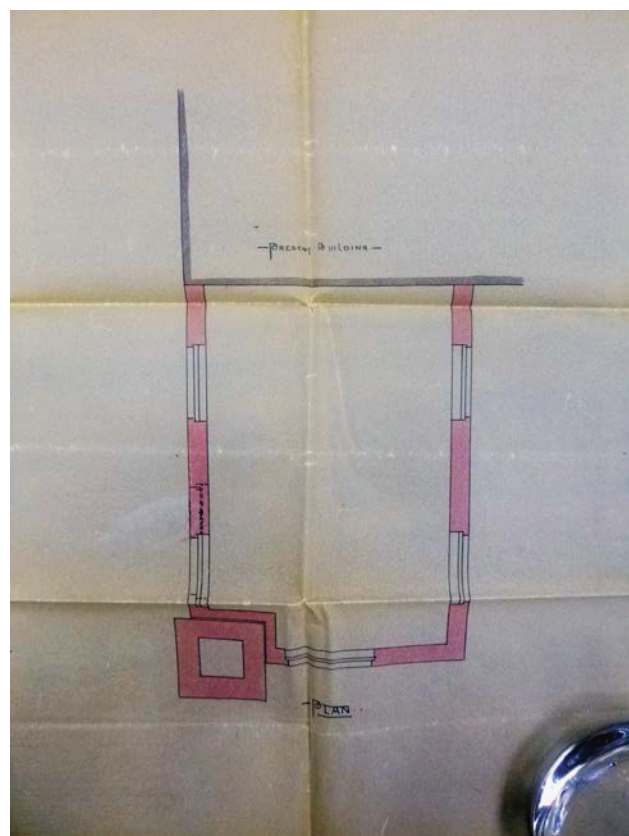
(right): Plan of chimney stalk and boiler house, 1882
